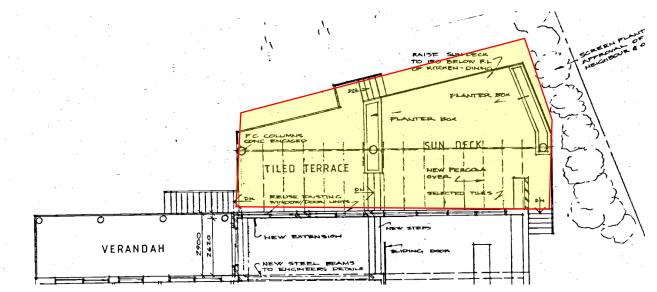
Approved first floor terrace and balcony (highlighted in yellow) (Source: GIPA from NBC)
